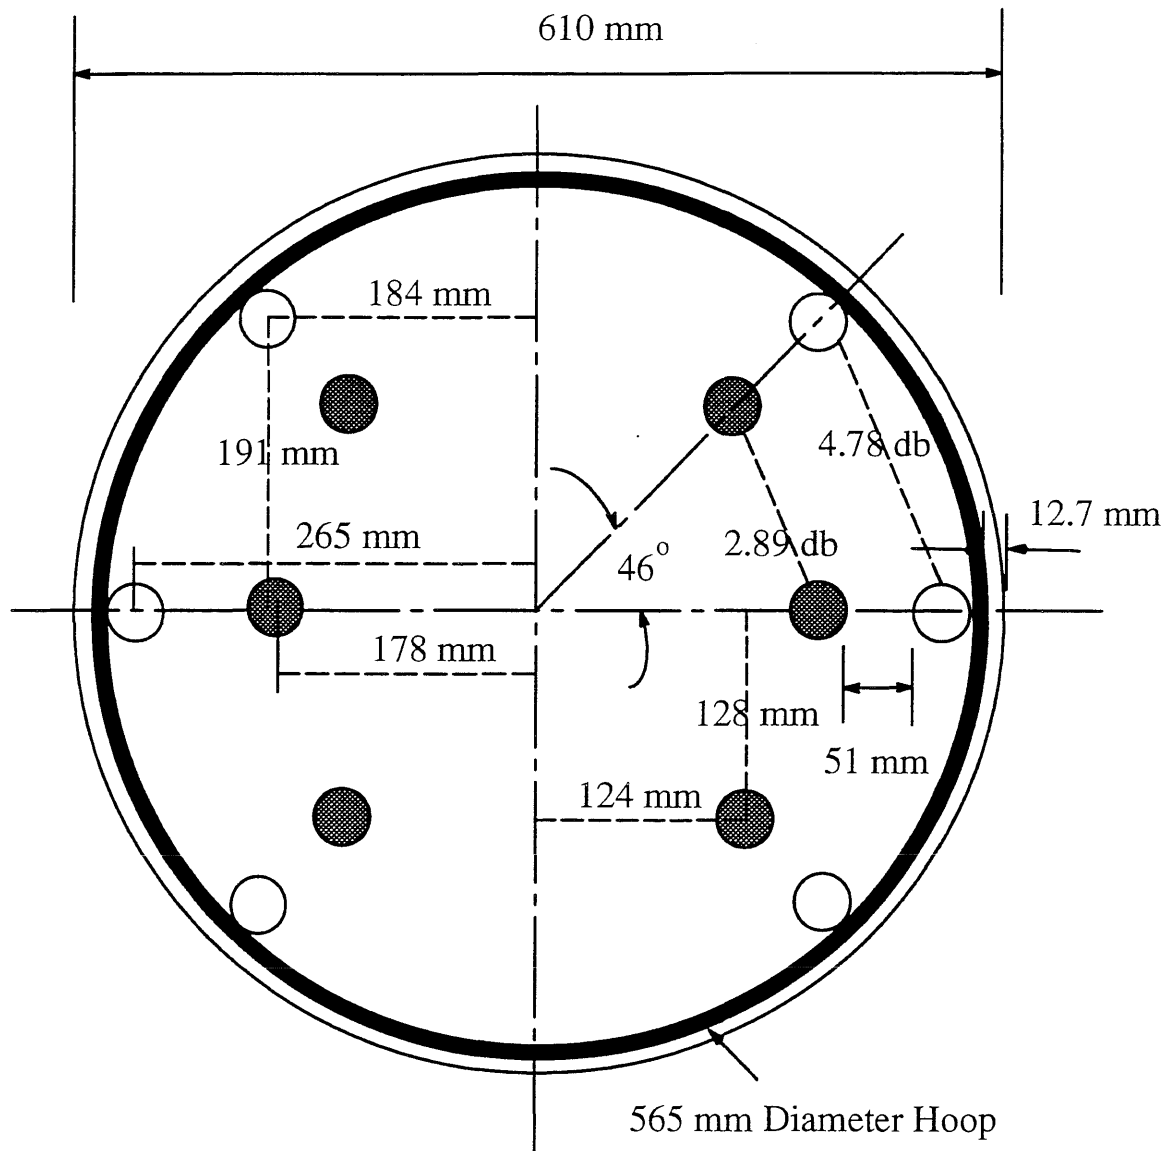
Cross Section for Column B-2 (L=51 mm, C=12.7 mm)
